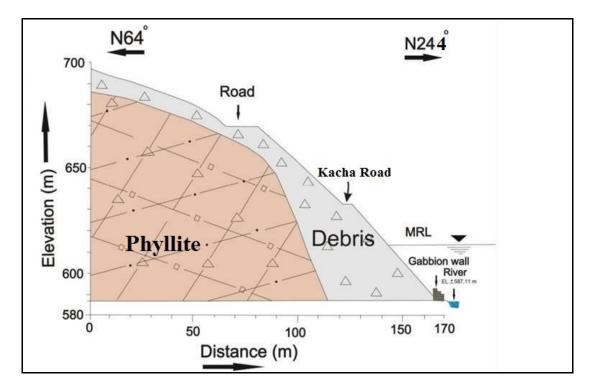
Geological Section of Slope LBS3 1.5 km d/s of Zero Bridge (near Chopra Village, Opposite of Pumping Unit)
